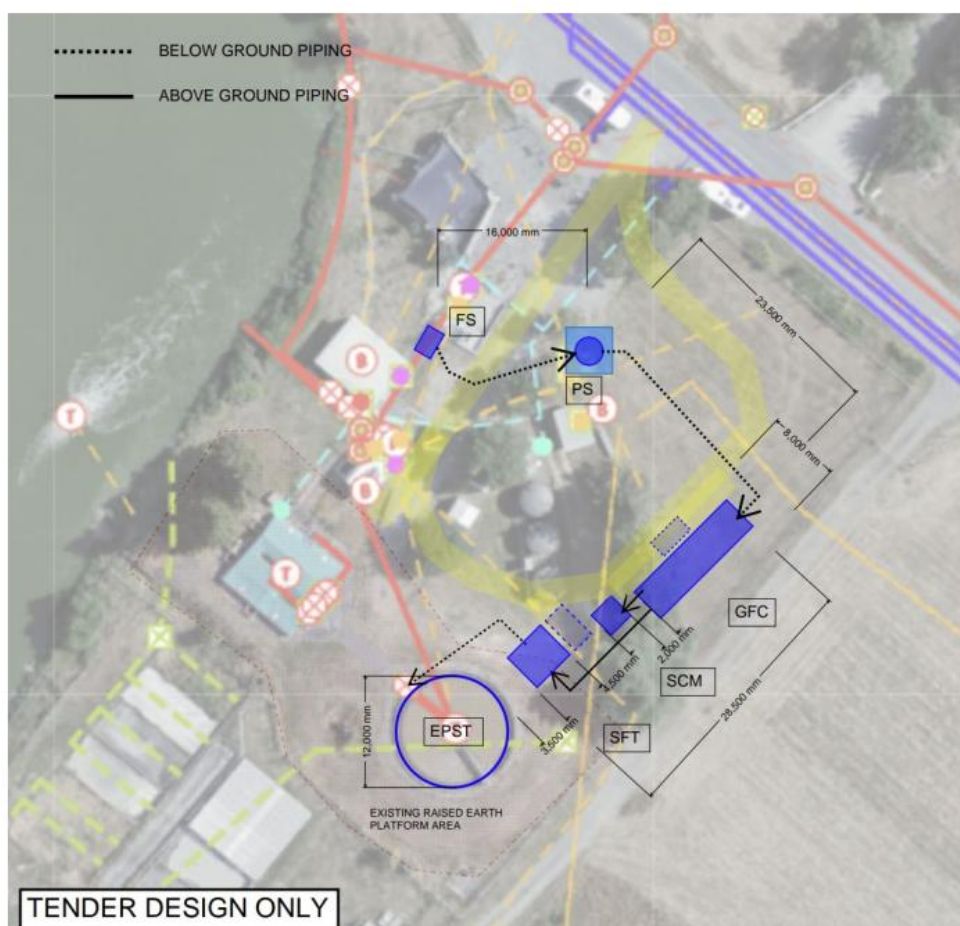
Schematic Layout of Upgrade at Dalefield Road
